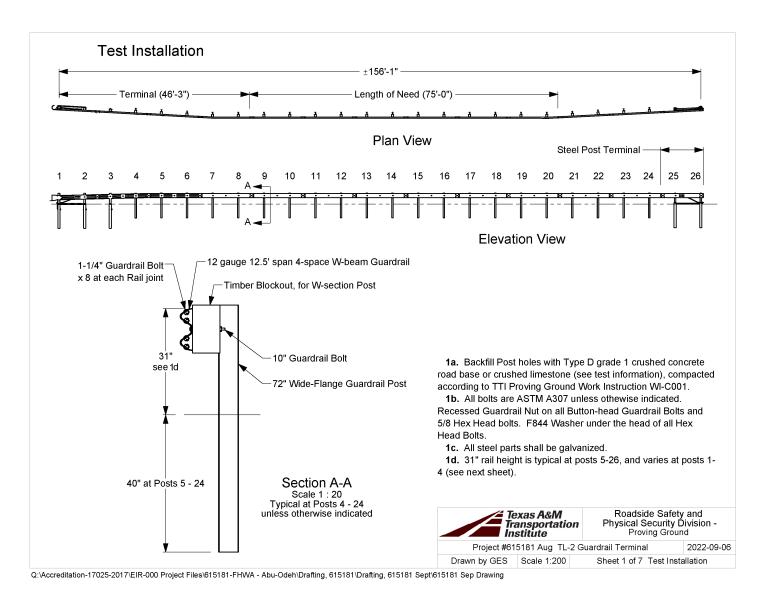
Details of TL-2 W-beam End Terminal Test 615181-01-5.
